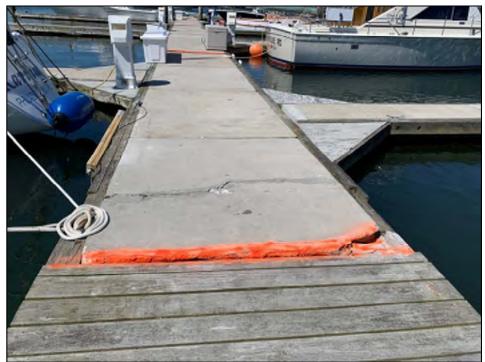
Concrete deterioration with trip hazard. Note previously repaired spall with continued deterioration..
